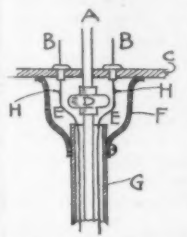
A. Gas-pipe; B. Supply-conductors; C. Ceiling; D. Insulating-Joint; E. Fixture Wires; F. Shell; G. Outer Casing of Fixture; H. Splices.
